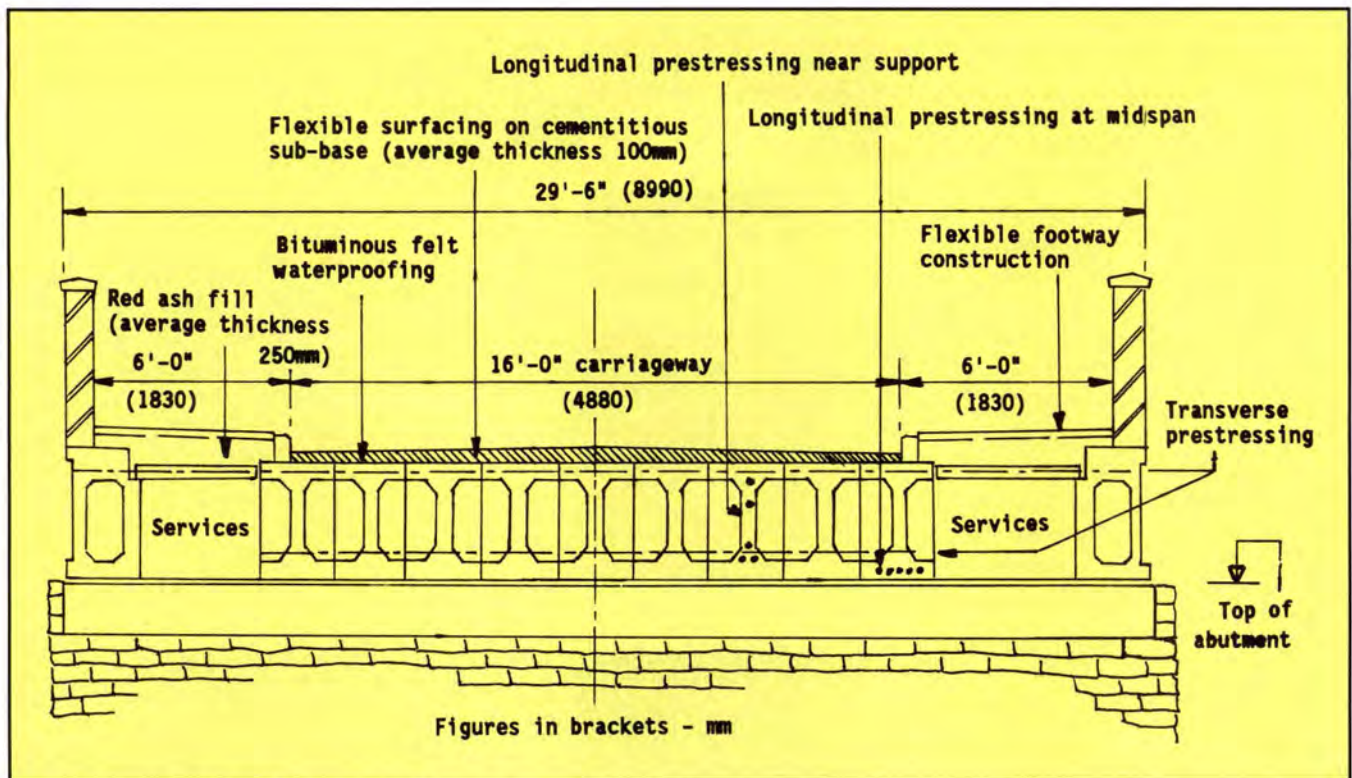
Cross section of Ynys-y-Gwas Bridge (from Ref. 1).
